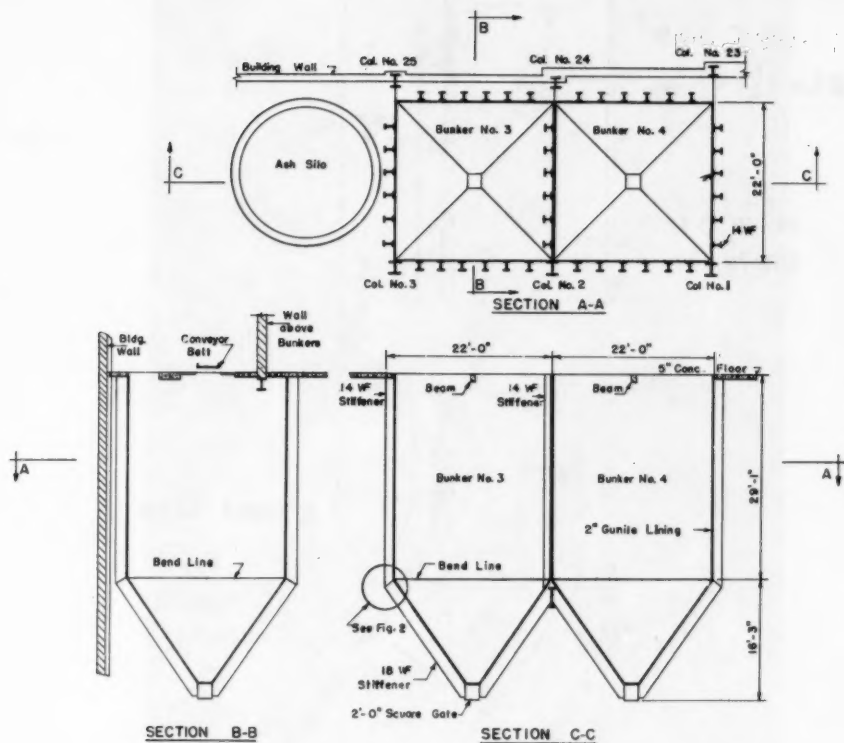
Sections through coal bunkers which were tested show general layout and important dimensions.
